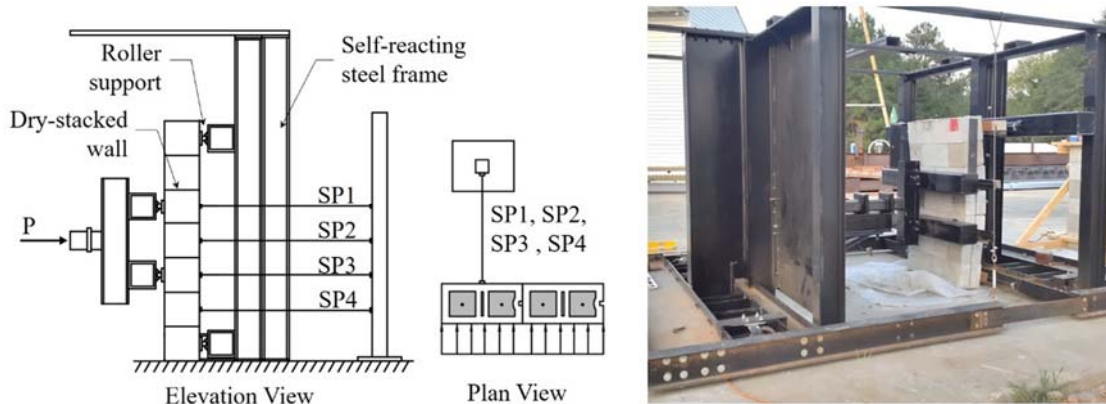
Representative dry-stacked wall test setup, elevation view and plan view (left), photo taken during experiments (right).
